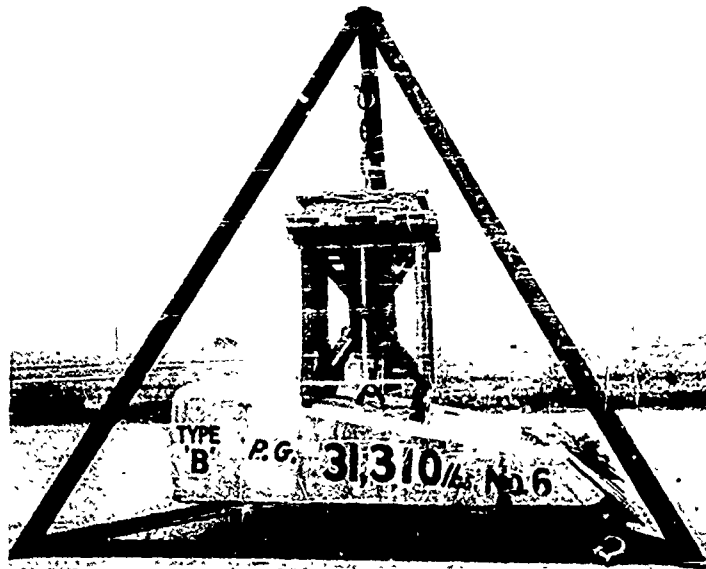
Prestressing longitudinal chain in 2470-lb mushroom-type concrete anchor.
